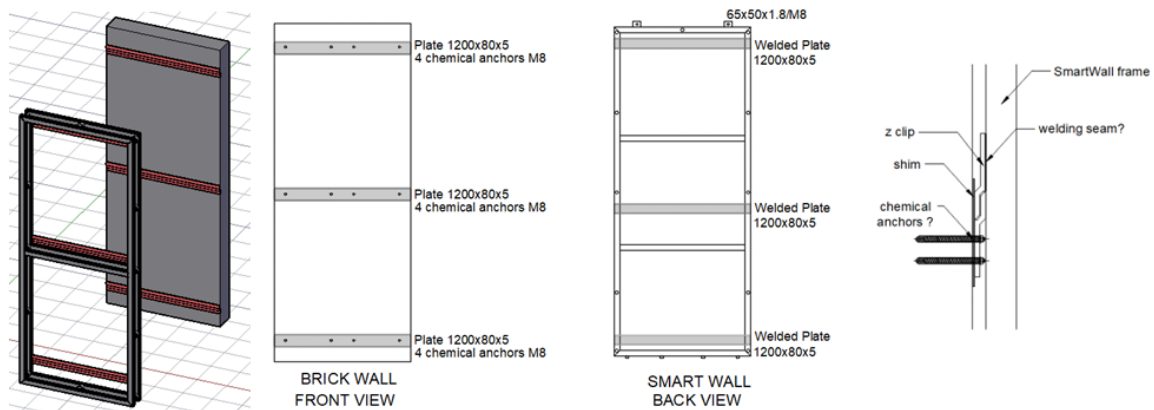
CONNECTION BETWEEN SMARTWALL AND INFILL WALL: 3D MODEL, DRAWINGS AND DETAIL.
